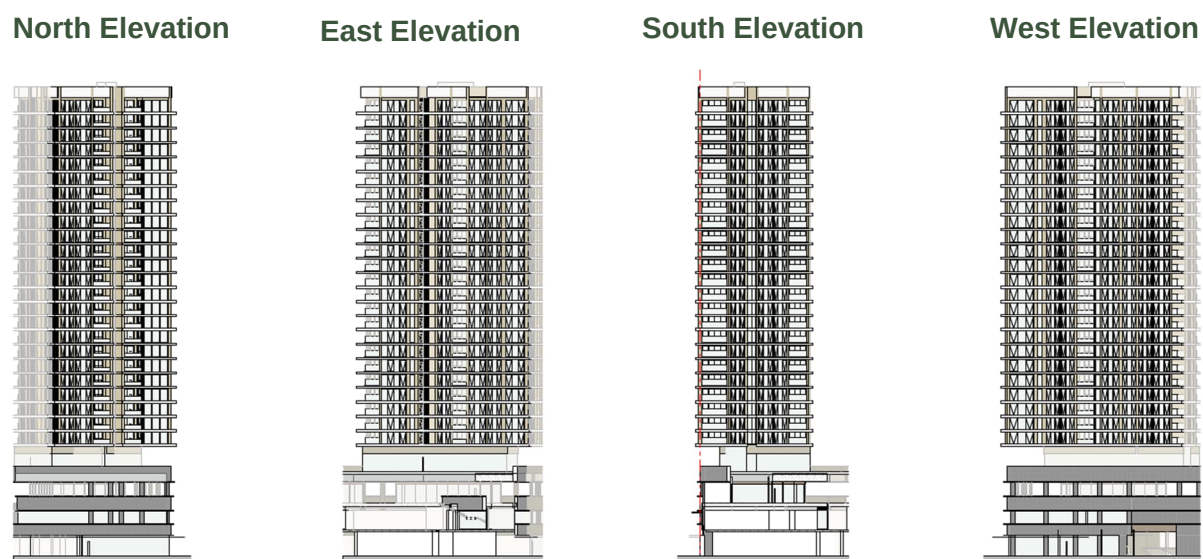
Representative elevation vies of the Proposed Development- Building 02
